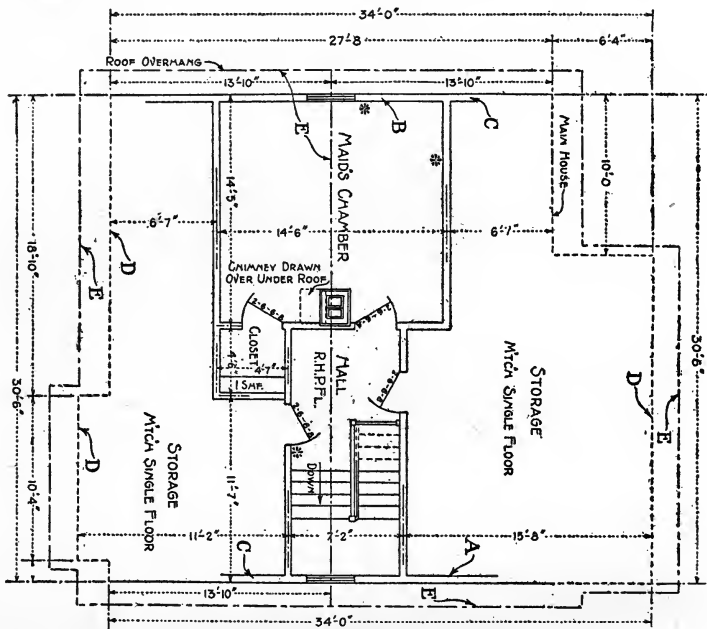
ATTIC PLAN—SCALE 1/12 IN. TO THE FOOT
